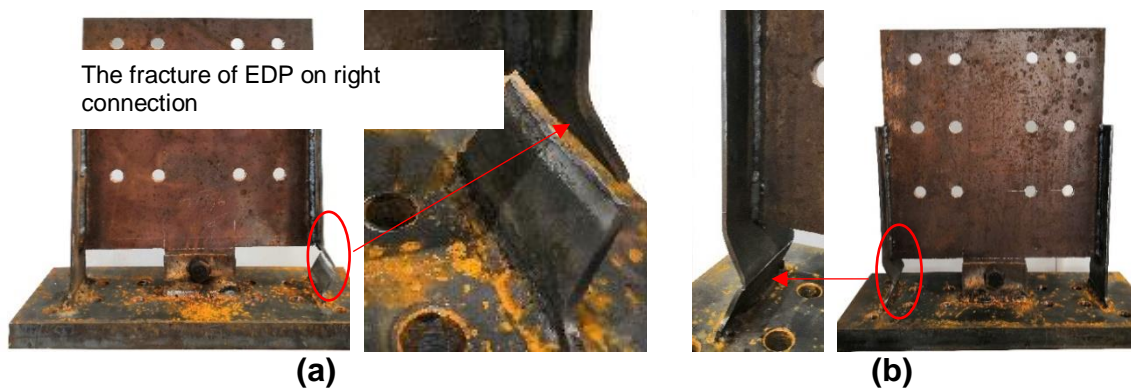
Failure mode; (a) failure of the left connection; (b) failure of the right connection
